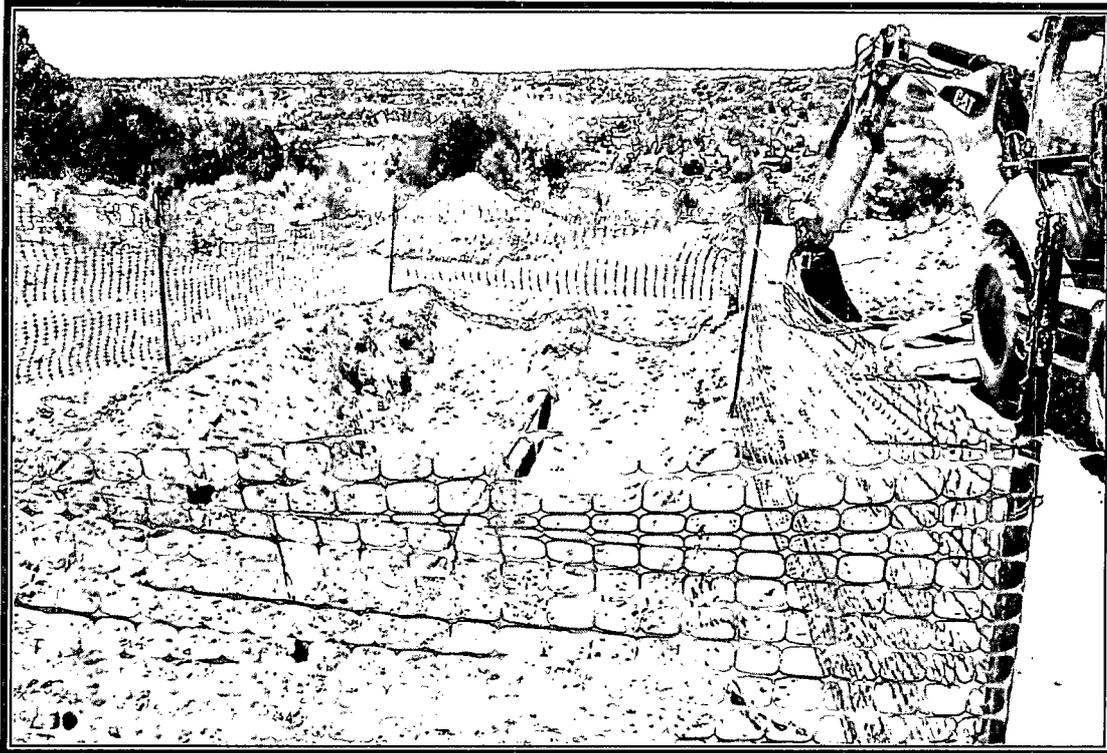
Excavation and stockpiled soil at the McKenzie #2 Well Tie Release site
